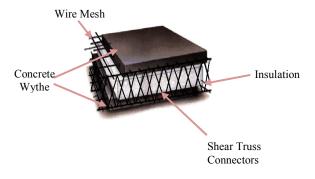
Precast Concrete Sandwich Panel with Double Shear Truss Connectors
